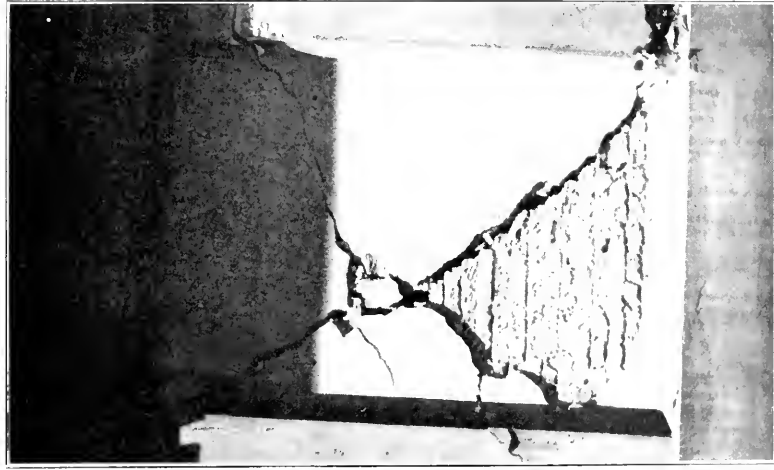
TYPICAL CRACK IN A BRICK WALL.
